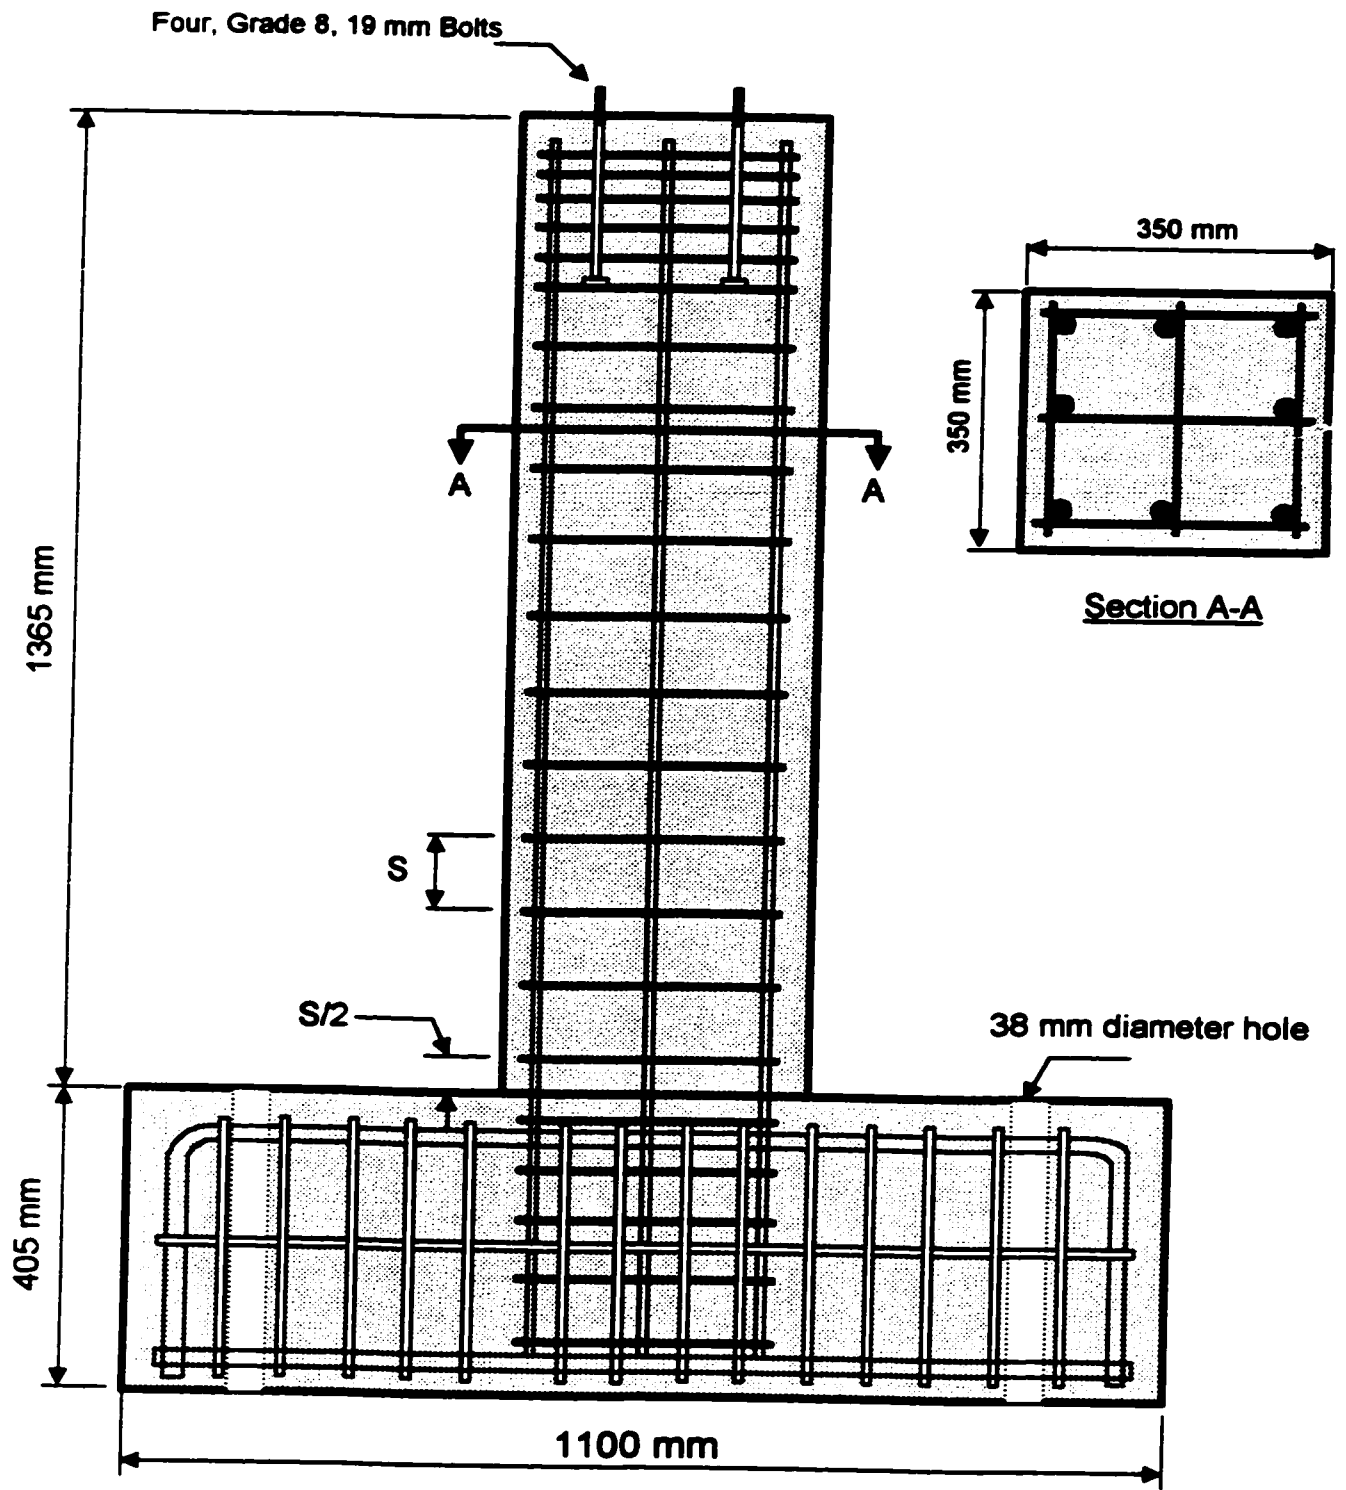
Geometry and reinforcement arrangement of column specimens
